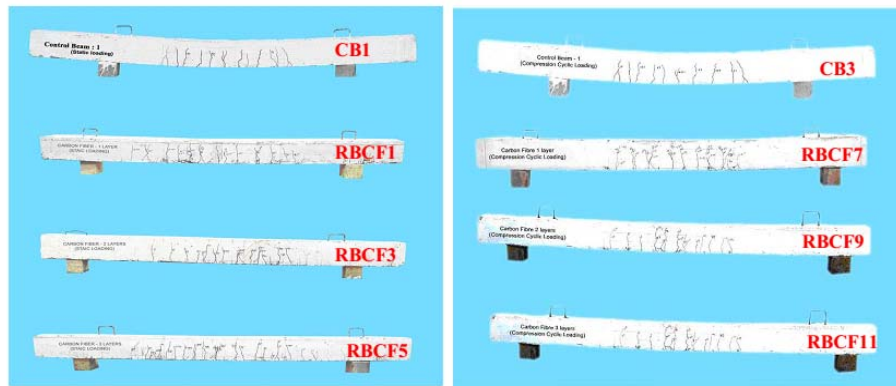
Crack pattern of tested beams (static and compression cyclic loading)
